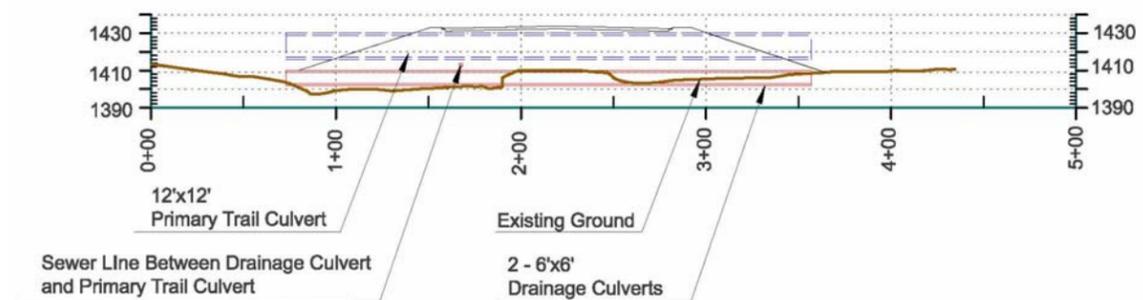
Alternative 1: Separate Drainage Culverts and Primary Trail (Sewer Line Between Drainage Culvert and Primary Trail (Profile View))
